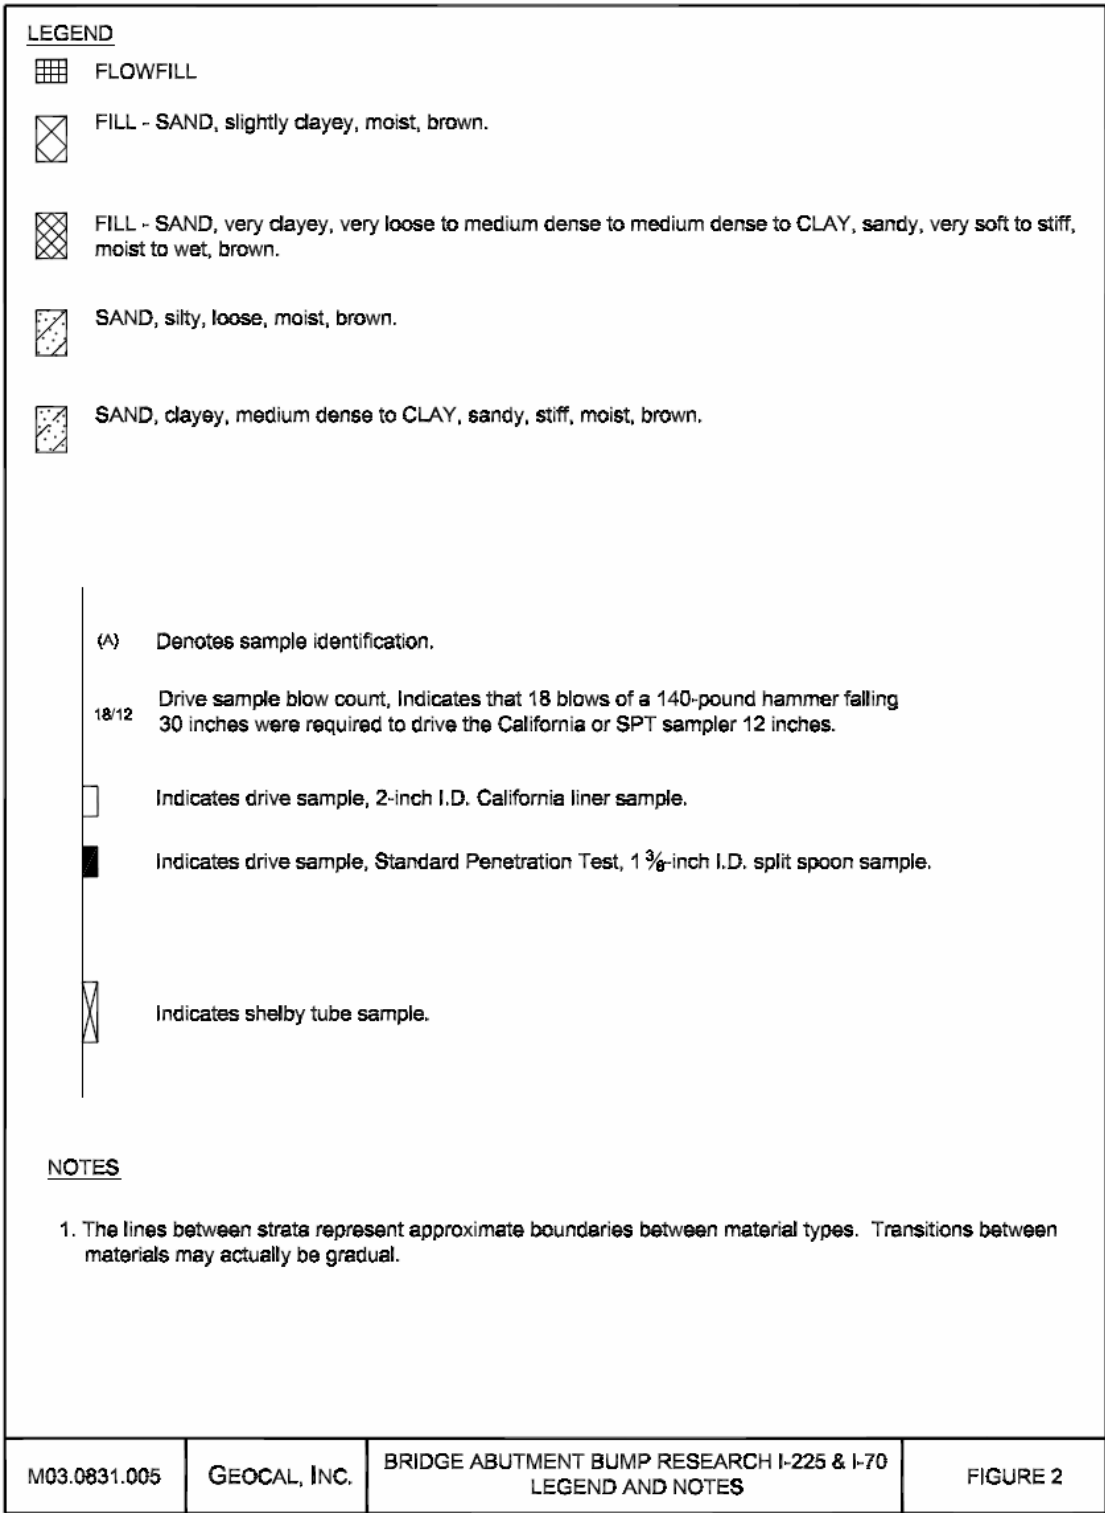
Boring Log for the I70/I225 Bridge Structure
